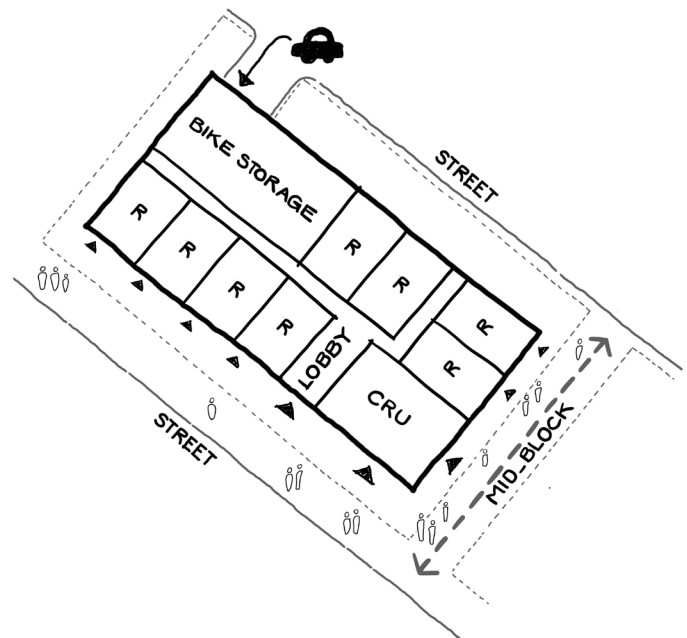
Active uses line the street and mid-block connection, while building services, vehicular, and loading access are provided from the lane or lowest-classified adjacent street.
